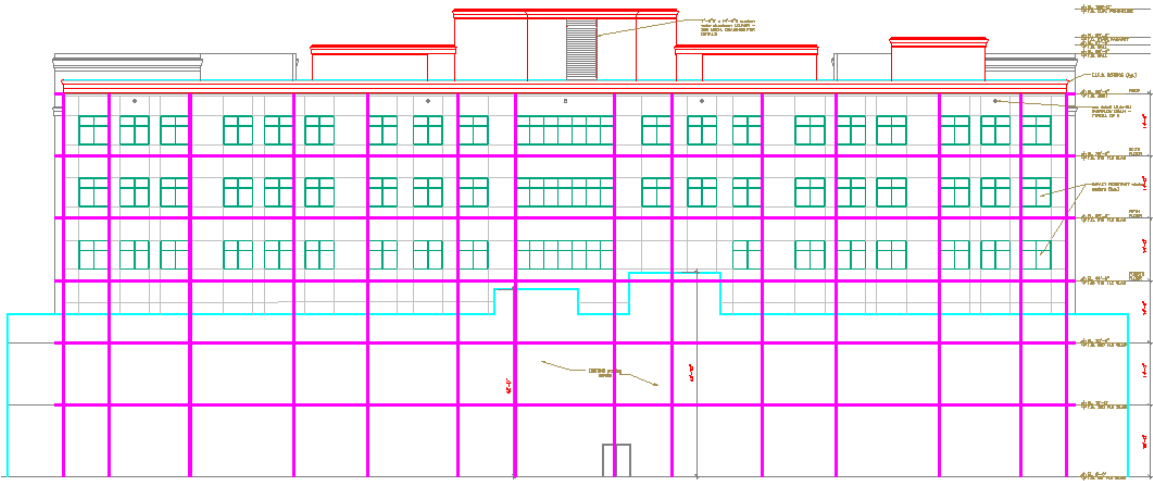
, Designed Expansion Joints (Magenta) for South Facade
